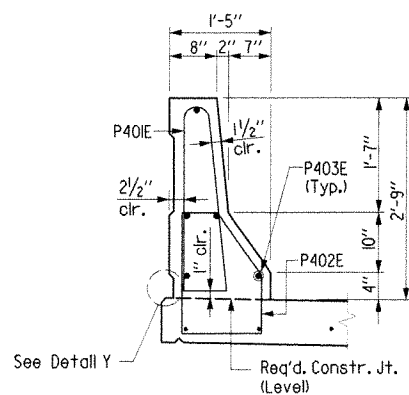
DETAILS OF OPTIONAL SLIPFORMING OF CONCRETE PARAPET RAIL
